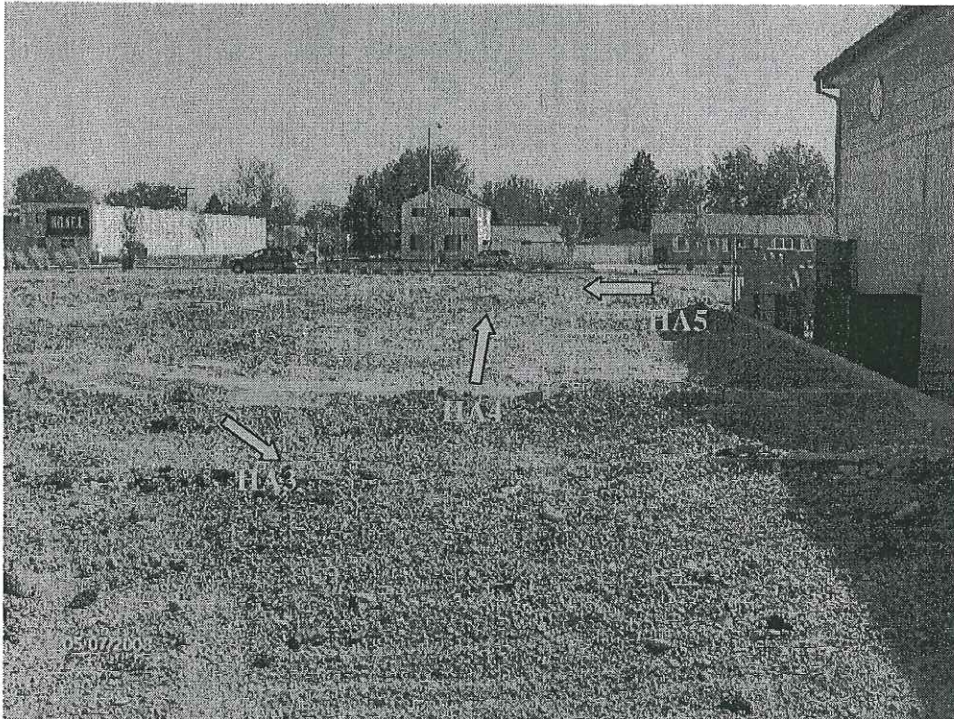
Photograph of soil boring locations HA3, HA4, and HA5. Concrete foundation of former building visible along western property boundary (photograph taken from the north).
